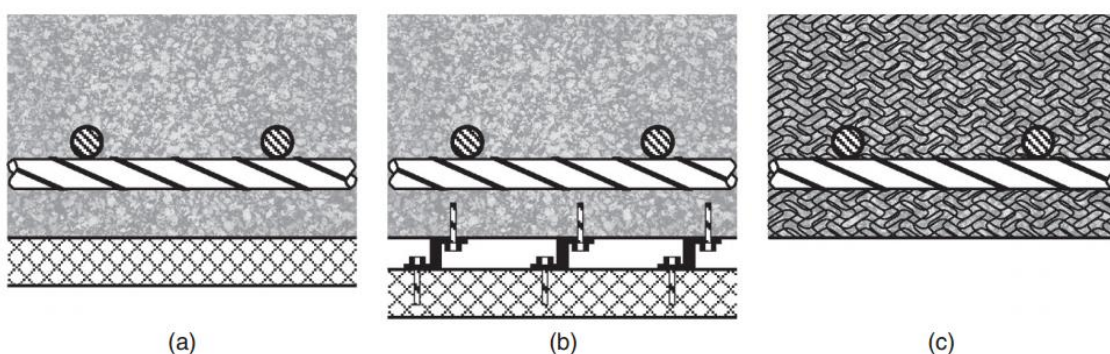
Types of passive fire protection (the bars in the concrete represent steel reinforcement rods). (a) A secondary layer of insulating material applied directly to the tunnel lining; (b) A panel cladding system. Certain types of cladding may be bolted directly to the tunnel lining, not separated by an air gap as shown. (c) T addition of fibers to the concrete mixture
